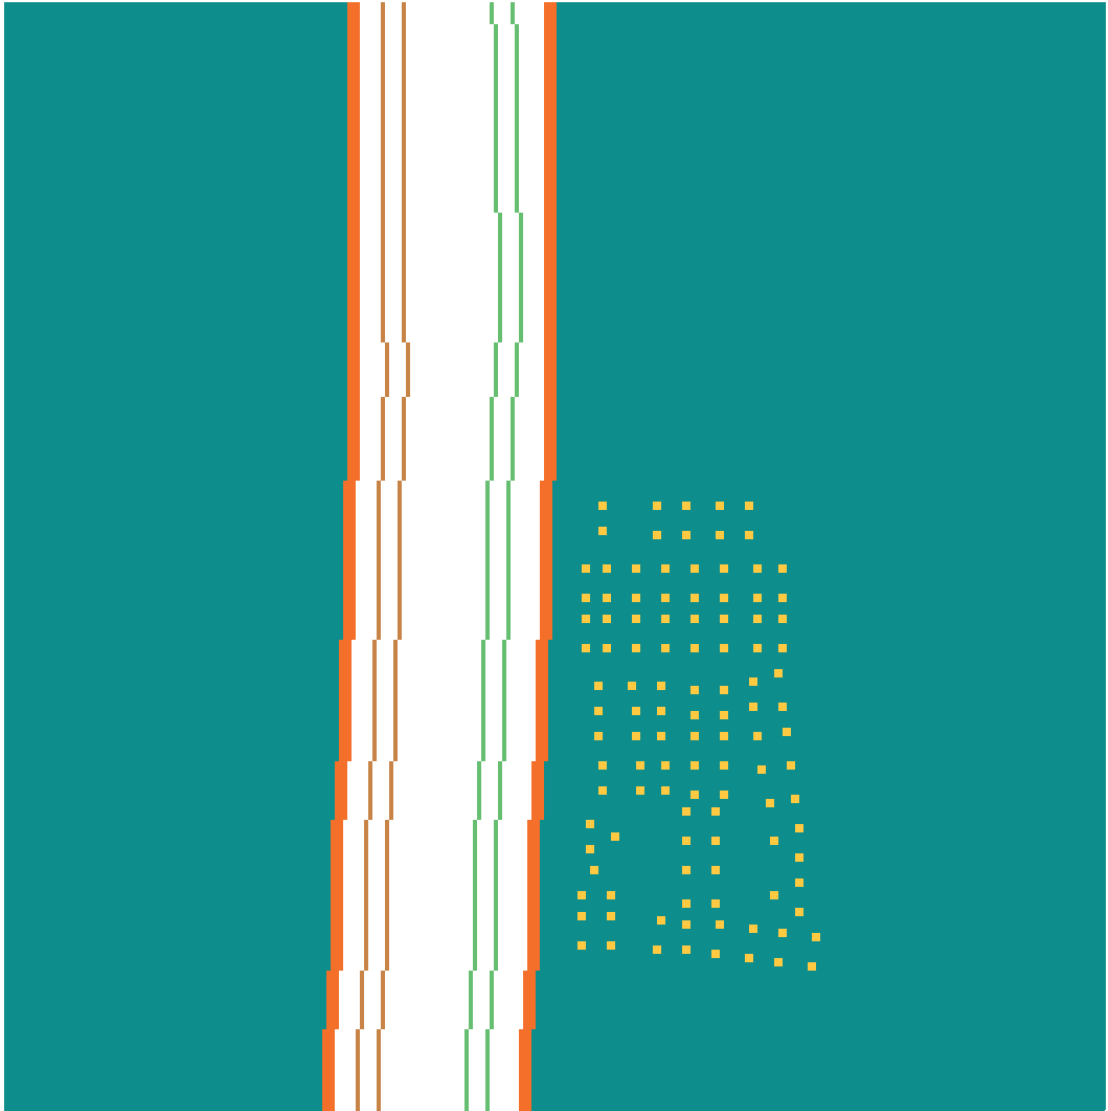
Horizontal section through the model of the West Block of Building W1 at track level, showing tunnel, track, soil and horizontal section through piled foundations
